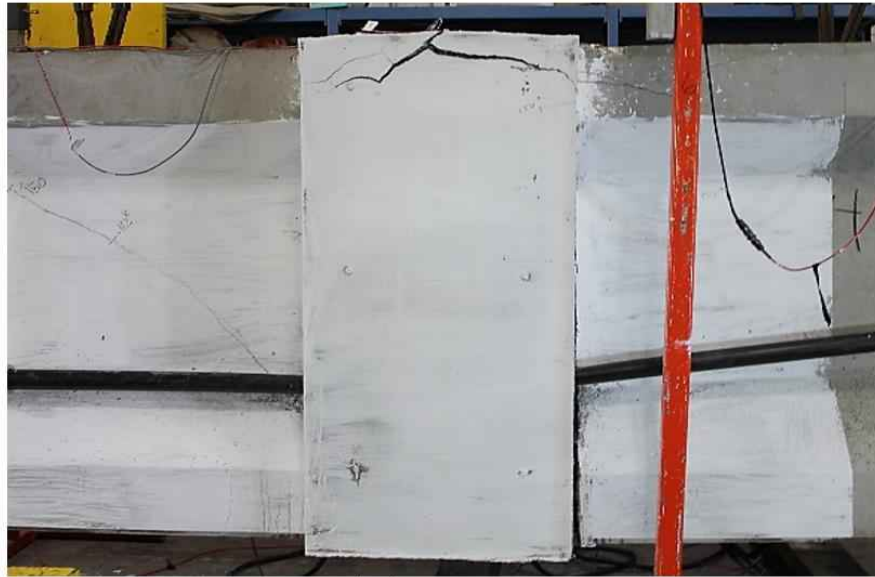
Compression failure at north epoxy joint (beam shown under load)
